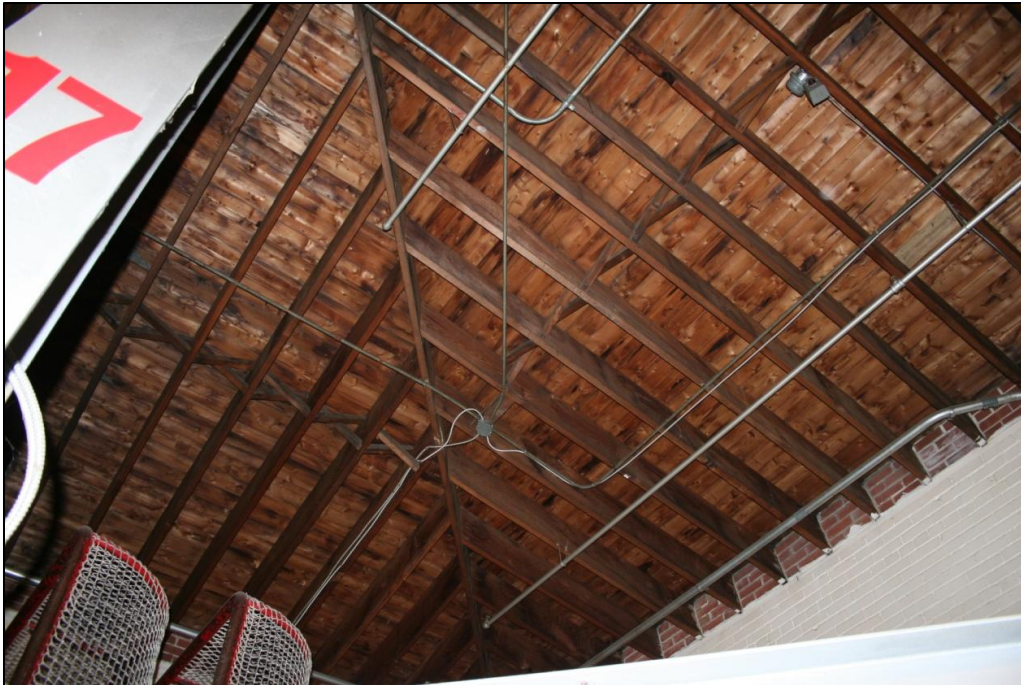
Detail showing the roof framing and the wood on the Memorial Arena roof.
